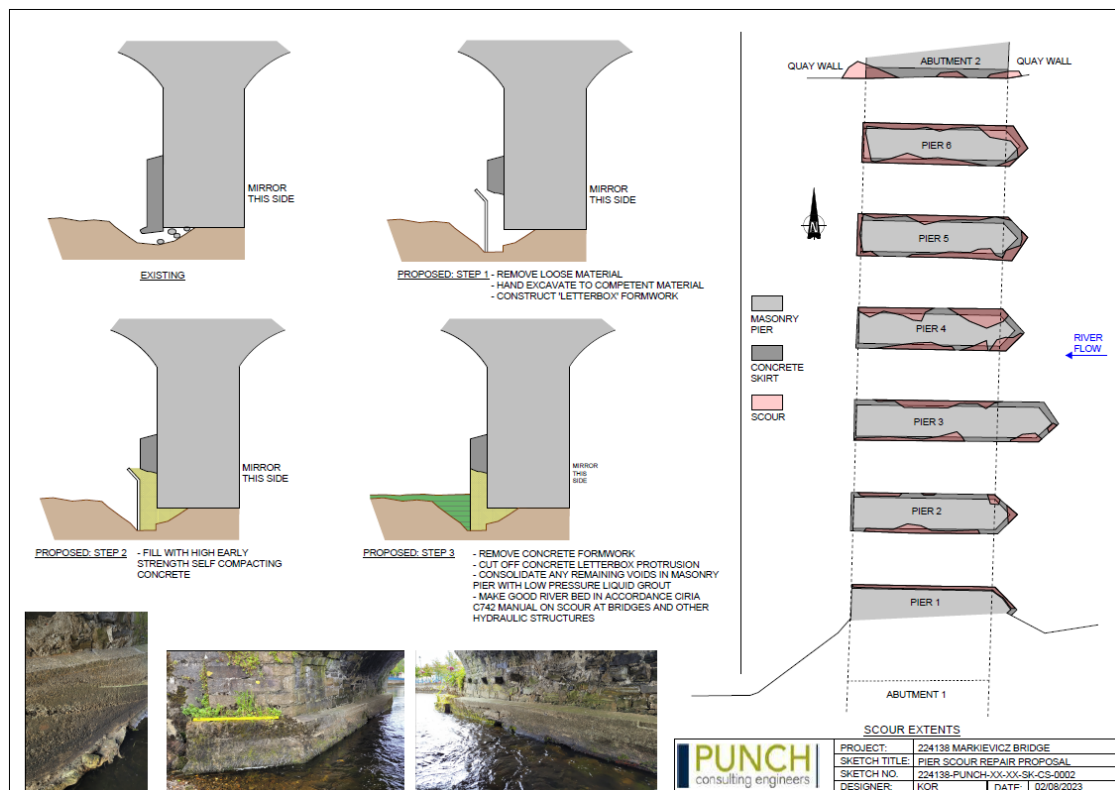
Scope of proposed scour repair works to bridge piers (Courtesy of Punch Consulting Engineers).
